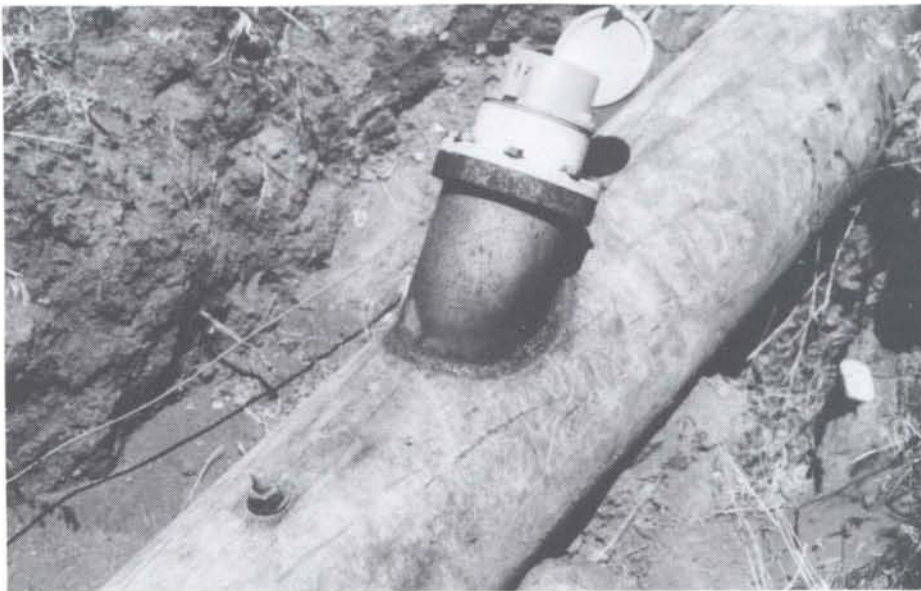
Water Specialties - Weld-on Inclined Propellor Meter
